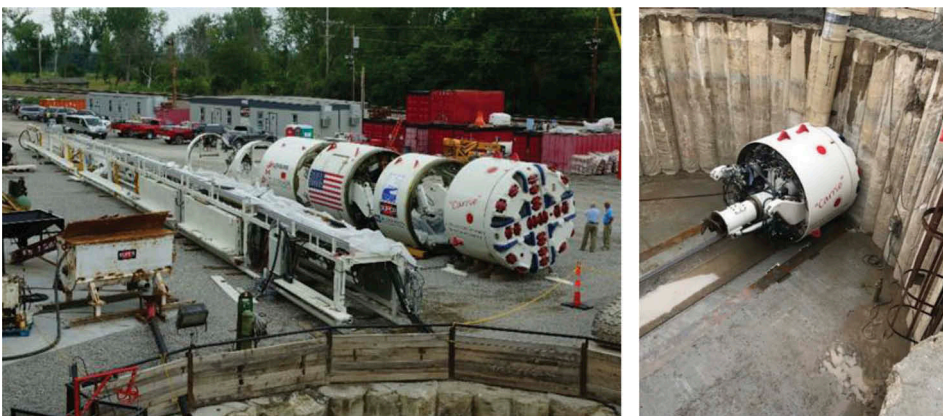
TBM Carrie's main parts (left) and launch cradle in the secant shaft (right).
